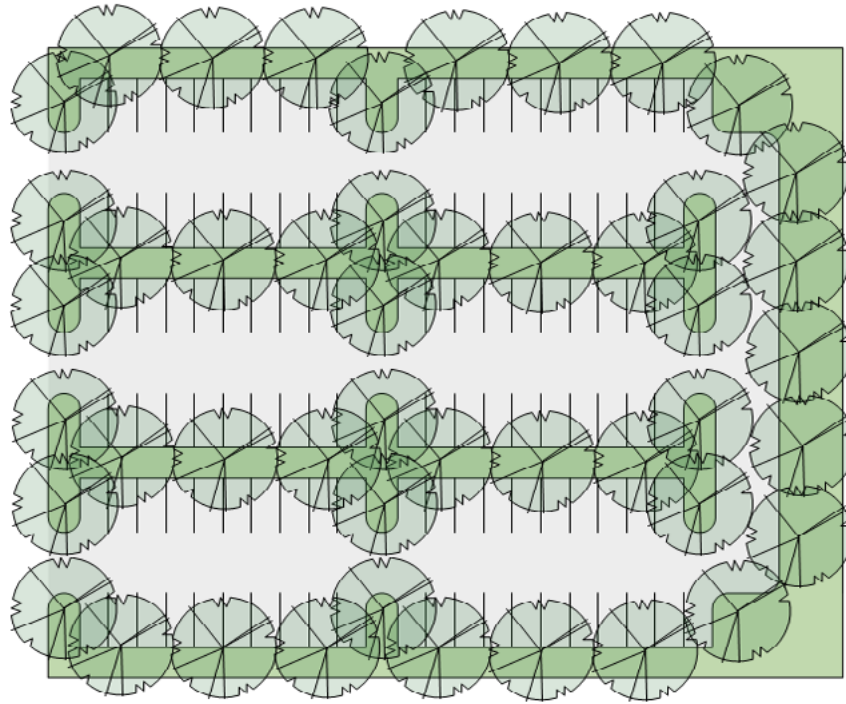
Example parking lot layout with linear planting strips and perimeter planting strips.
